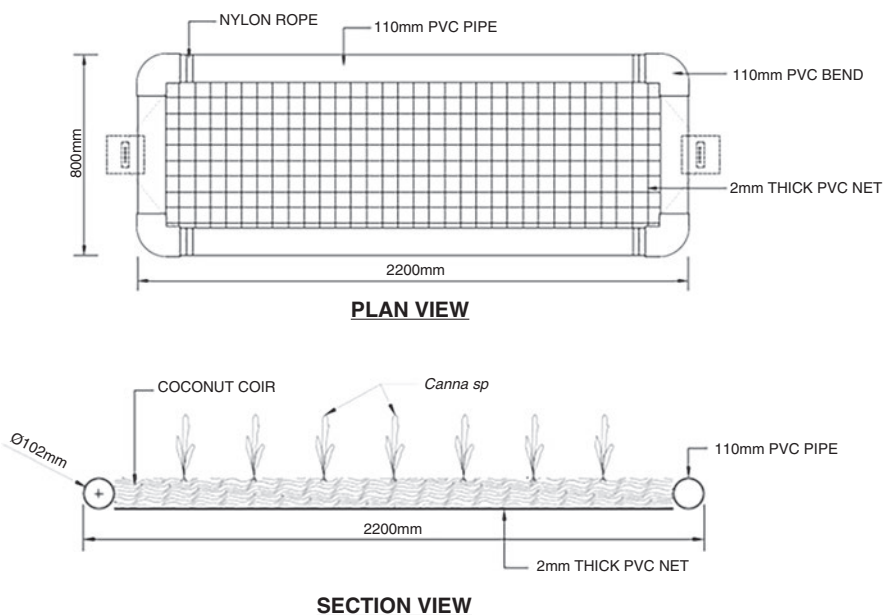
Plan and sectional view of a constructed floating wetland
